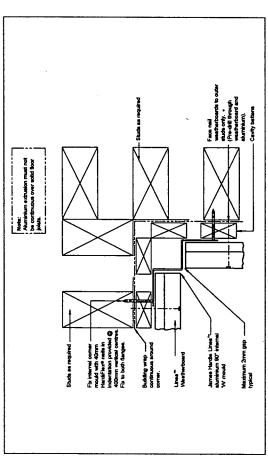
CAVITY INTERNAL 90° ALUMINIUM 'W' MOULD CORNER
